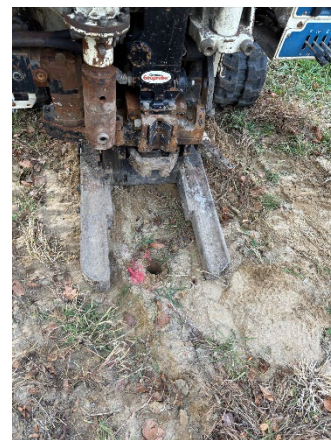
Viewing 8225 SB03 Drilling, Facing North.
